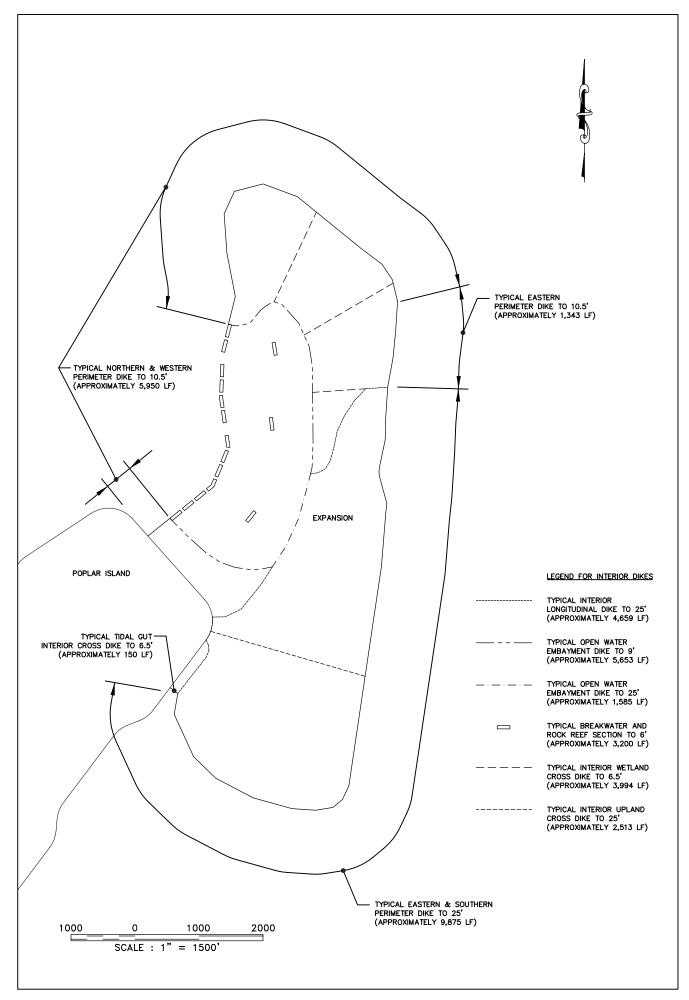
Layout of Typical Sections for Open Water Embayment Option
